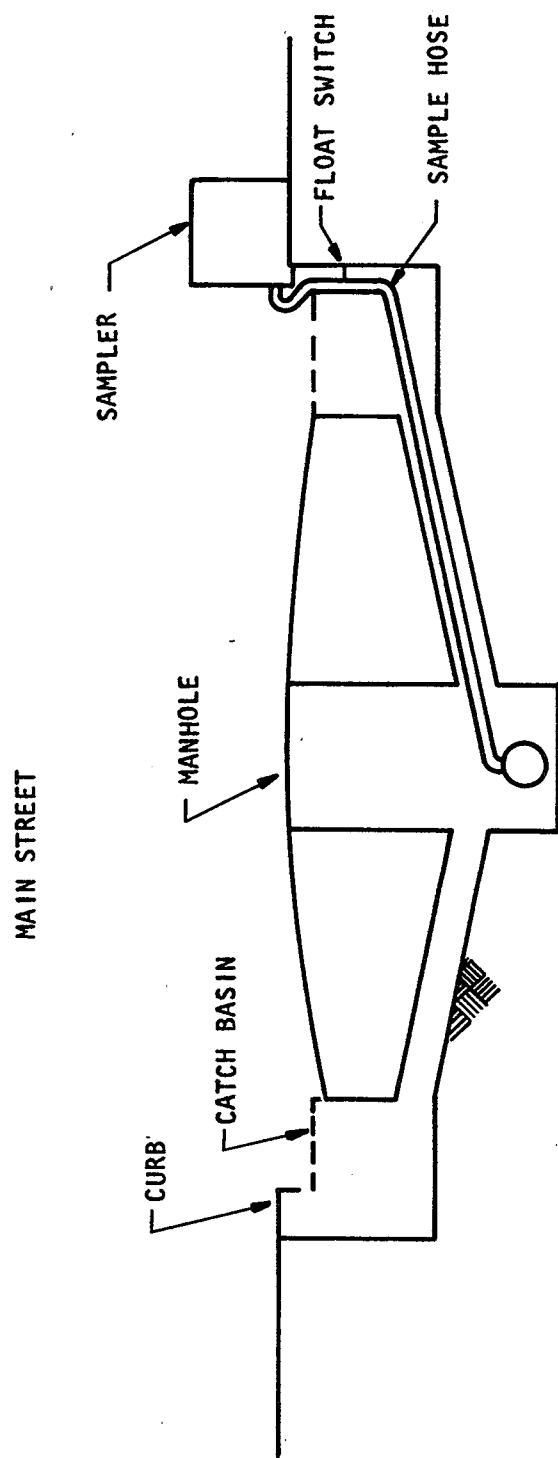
Typical sampler installation (installation at overflow No. 5, in storm sewer).
